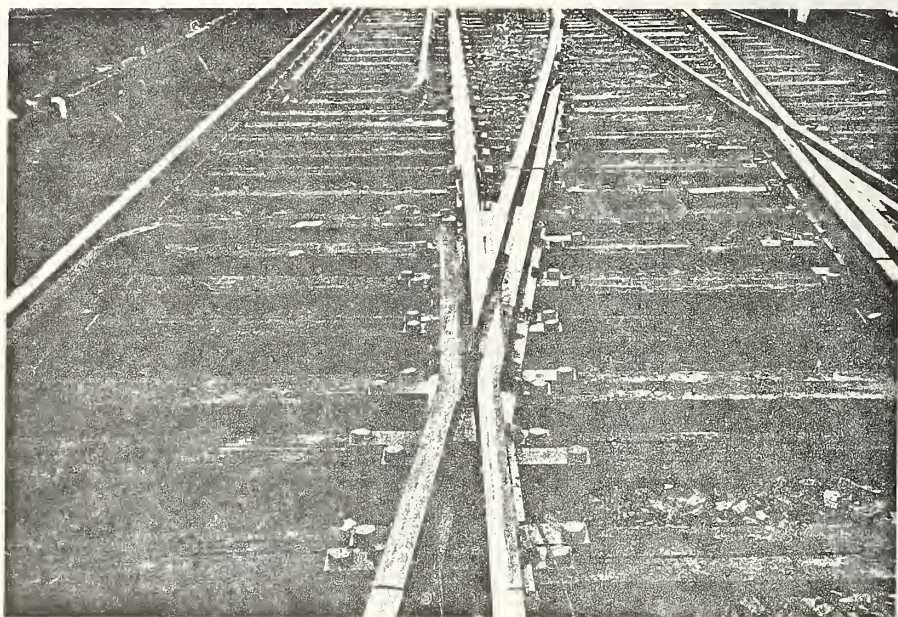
ELEVATED STRUCTURE TEST TRACK
